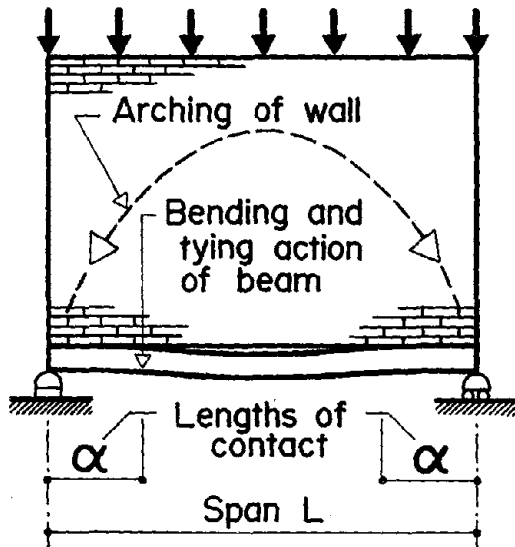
COMPOSITE ARCHING ACTION OF WALL - BEAM STRUCTURE
